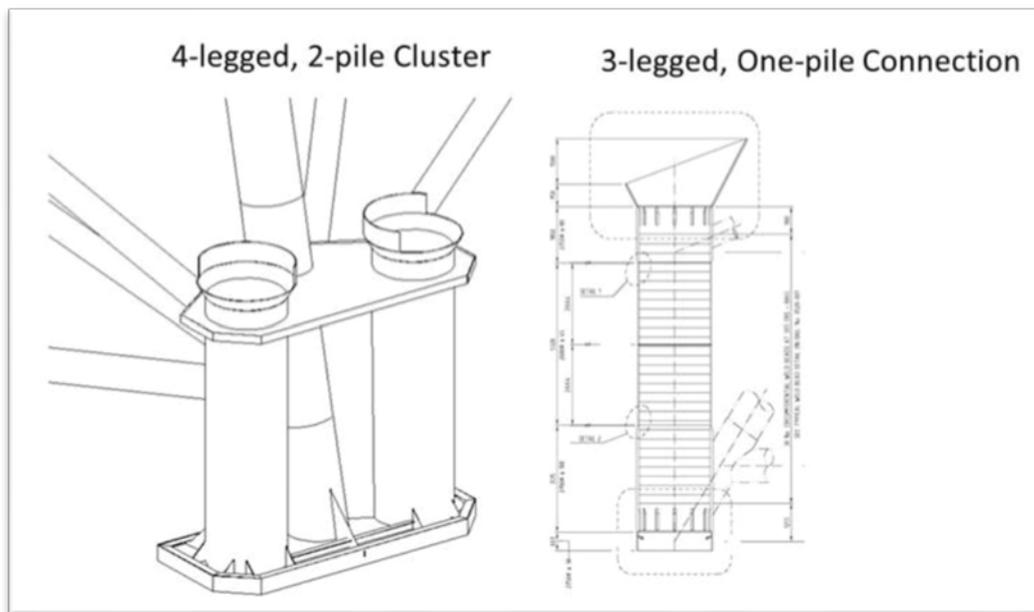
For a “one pile” connection on a 3-legged jacket, the main brace is typically directly connected to the sleeve (right), but for a “multi pile” cluster on a 4-legged jacket the connection to the main brace is through Yoke and shear plates (left). Note the horizontal lines of the weld beads in the “one pile” connection. Illustration from Aker BP & Equinor.
